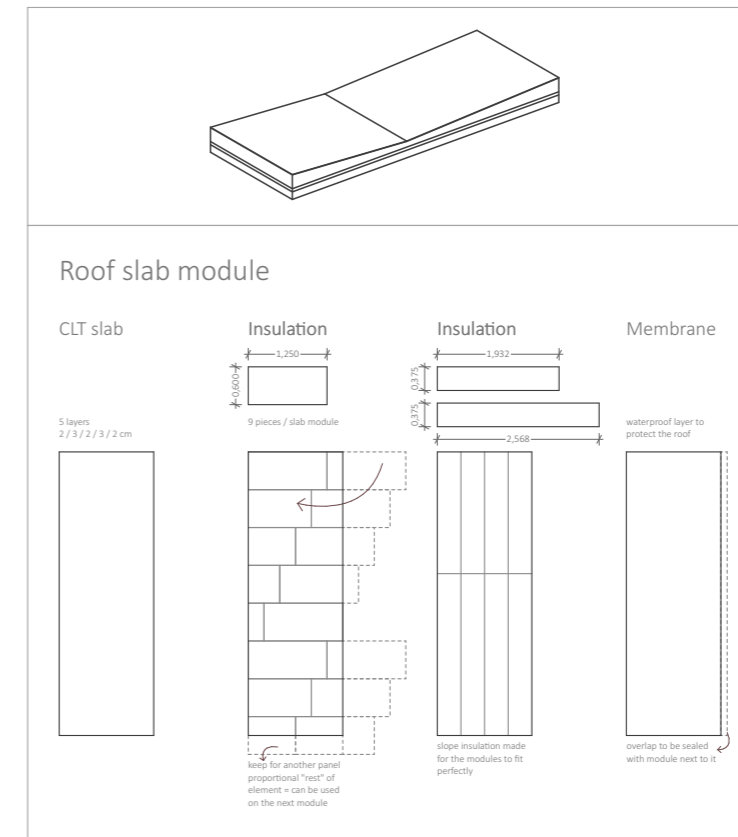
Drawing, Roof slab composition - 1:20. ©Personal illustration.
